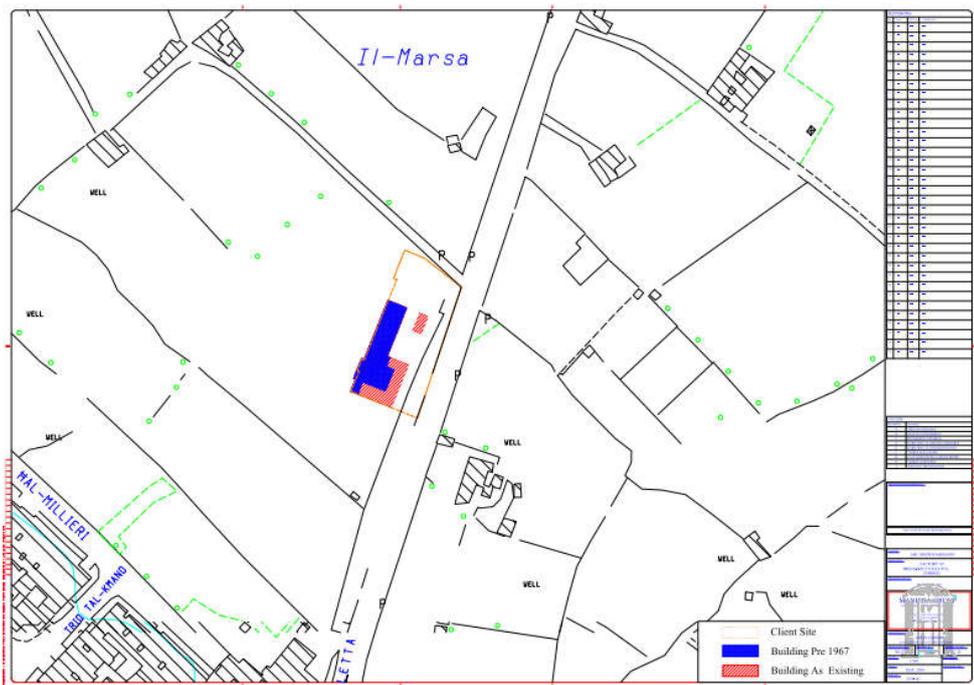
Existing/Proposed Site Plan (Source: Doc. PA03595/16/1i)
